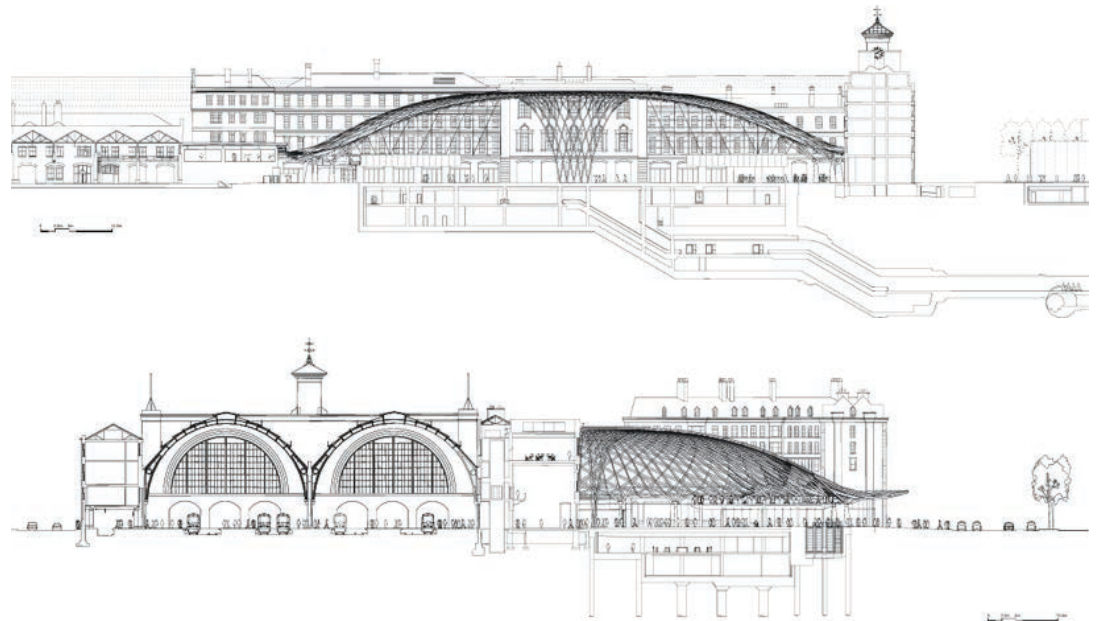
KING'S CROSS STATION - SECTIONS
